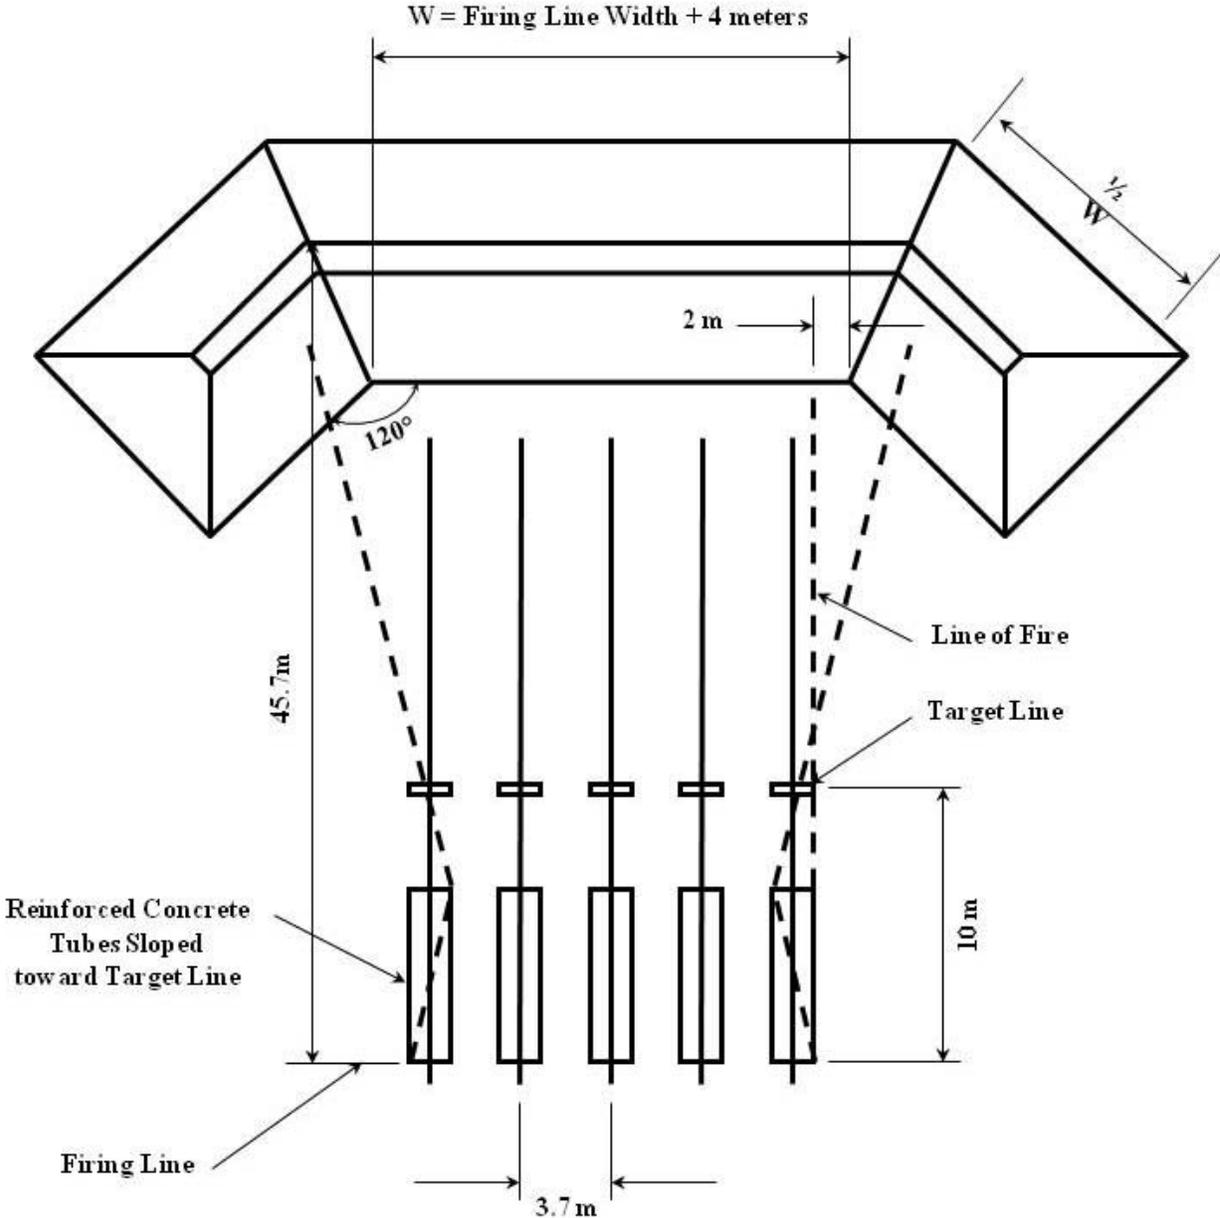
Machine Gun, 10-Meter Tube Range Typical Range Configuration
